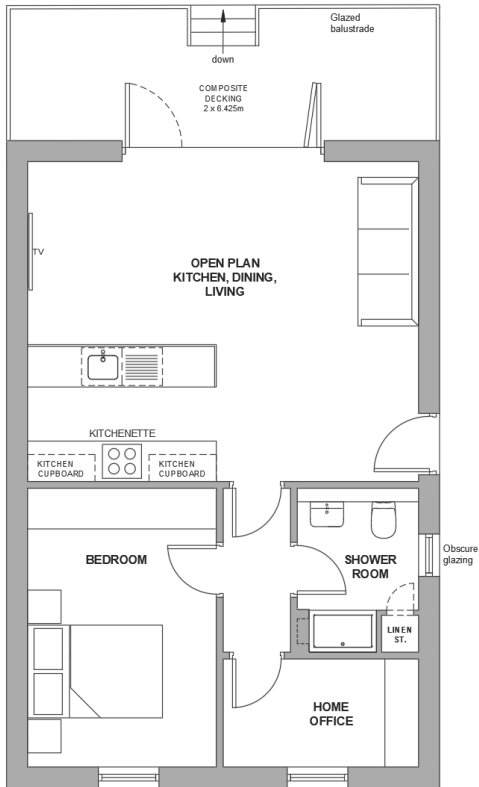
PROPOSED ANNEX FLOOR PLAN
